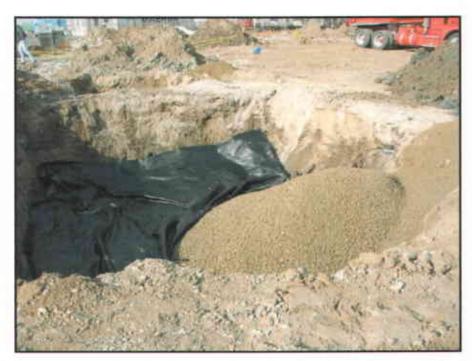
Mirafi fabric and drain rock were used during backfilling in areas where soft, plastic native soil were exposed.
